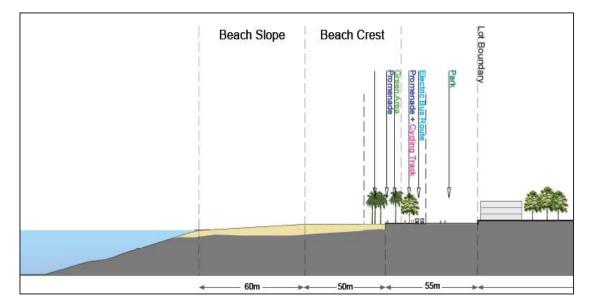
Indicative cross section of beach (Source: Benoy Masterplan Final Report January 2014).
